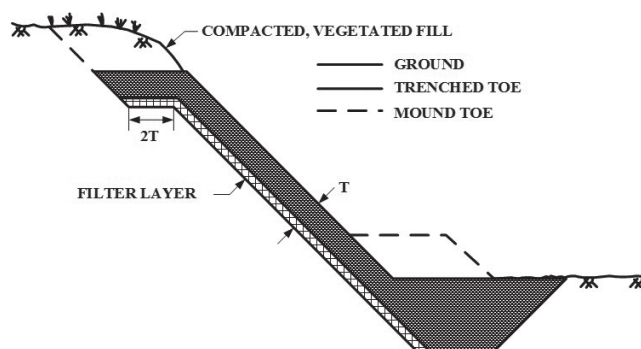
Typical riprap installation (after Brown and Clyde 1989).
